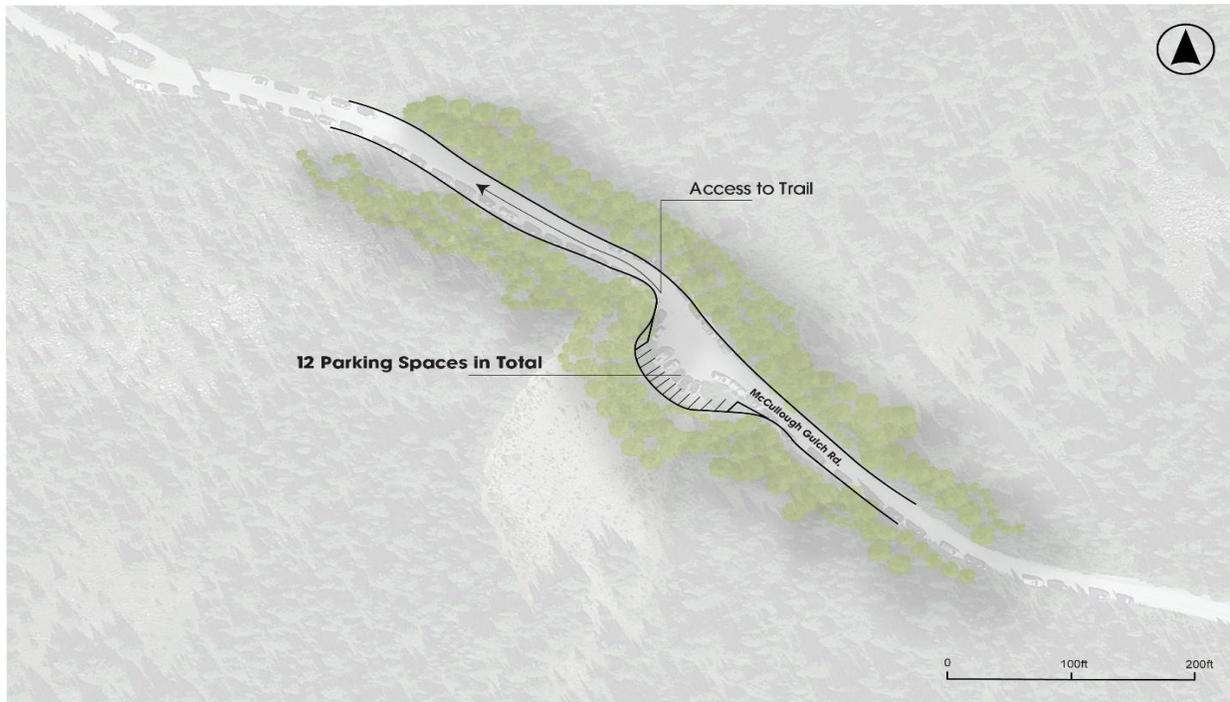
McCullough Gulch Trailhead Access Plan Concept (Parking Lot)
